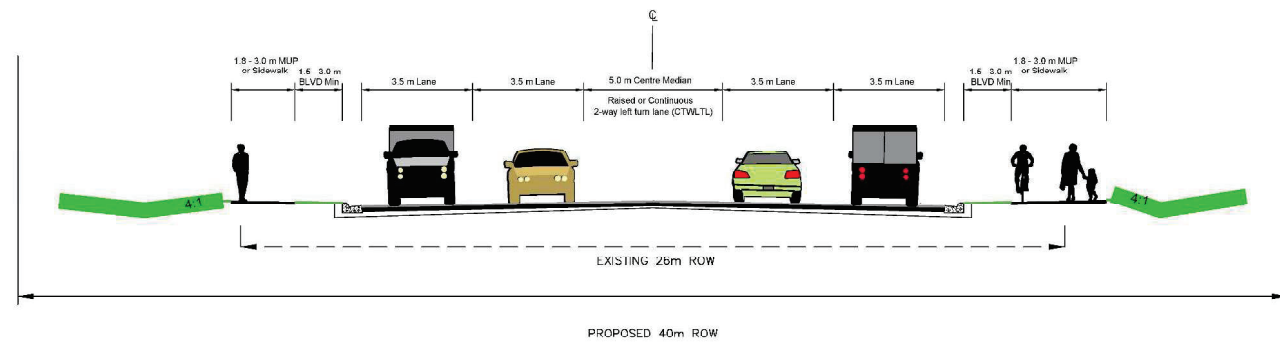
Section 1 Alternative 4 – 5-Lane Urban Cross Section
